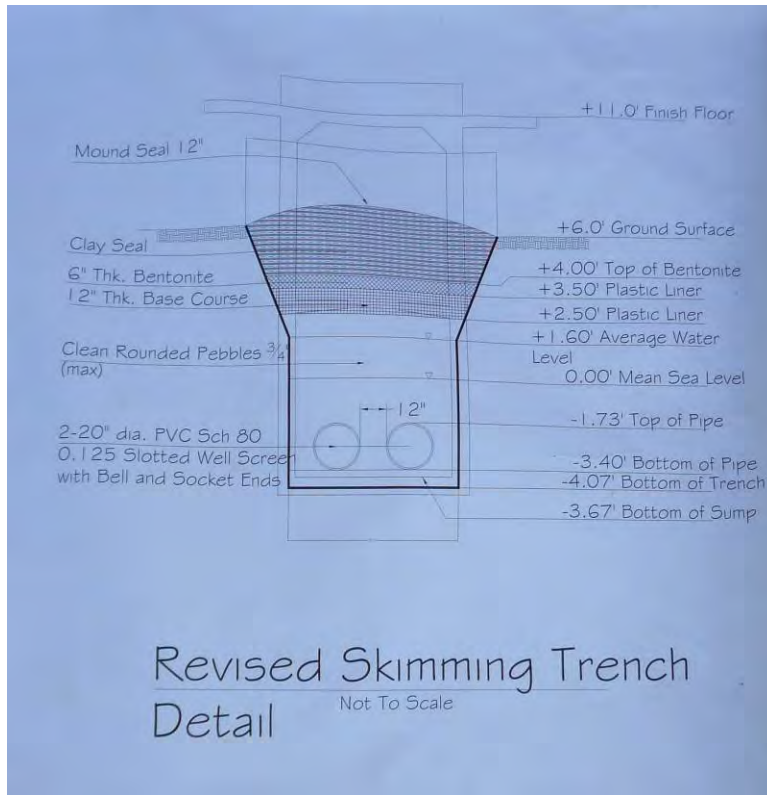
Record Drawing of the Maui II Well, Skimming Trench Cross-section
